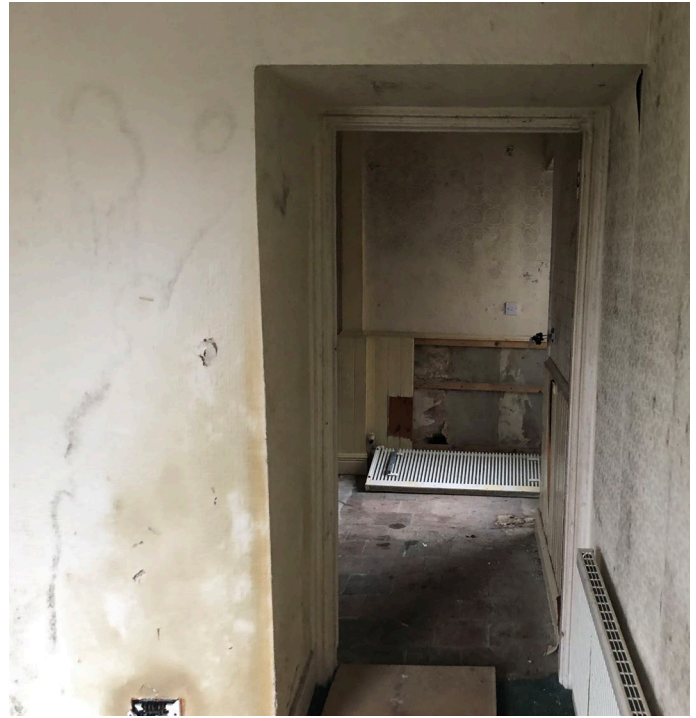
Internal Elevation 2.A. Doorway to Room 3-Kitchen.
